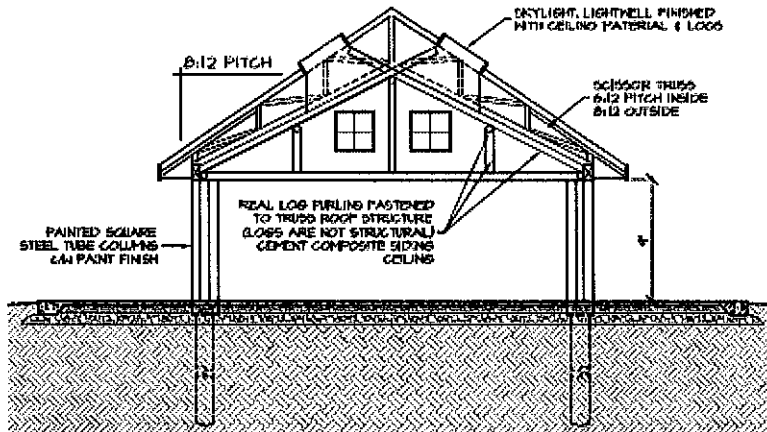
Parkland CLASS Pavilion Elevation and Section
